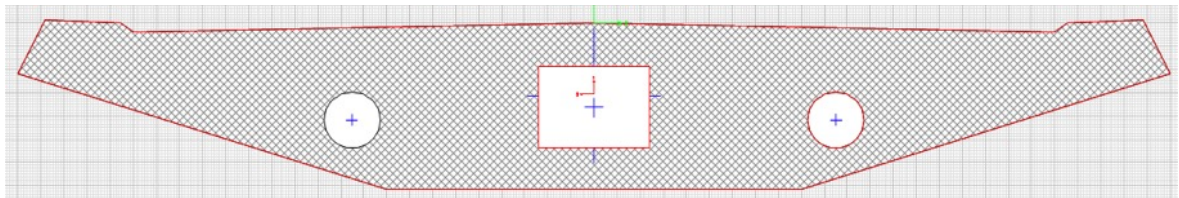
Cross-section detail of the transition between the pylon and the main span in FEM.
